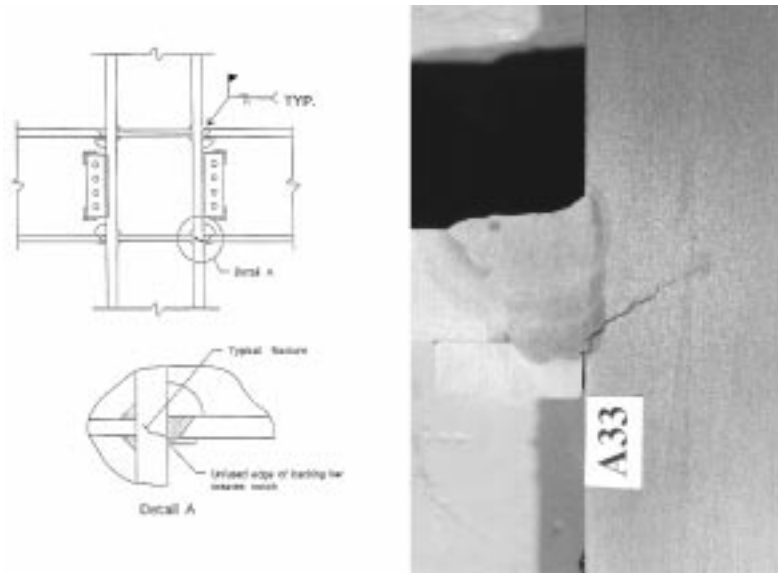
Welded steel moment frame (WSMF) connection showing (a) location of typical fractures and (b) typical crack, which originated at the backing bar notch and propagated into the column flange.
